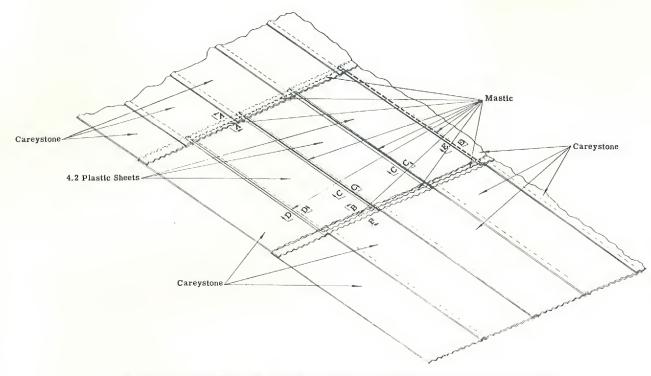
DETAILS OF CAREYSTONE CORRUGATED WITH PLASTIC 4.2 CORRUGATED SHEETS
